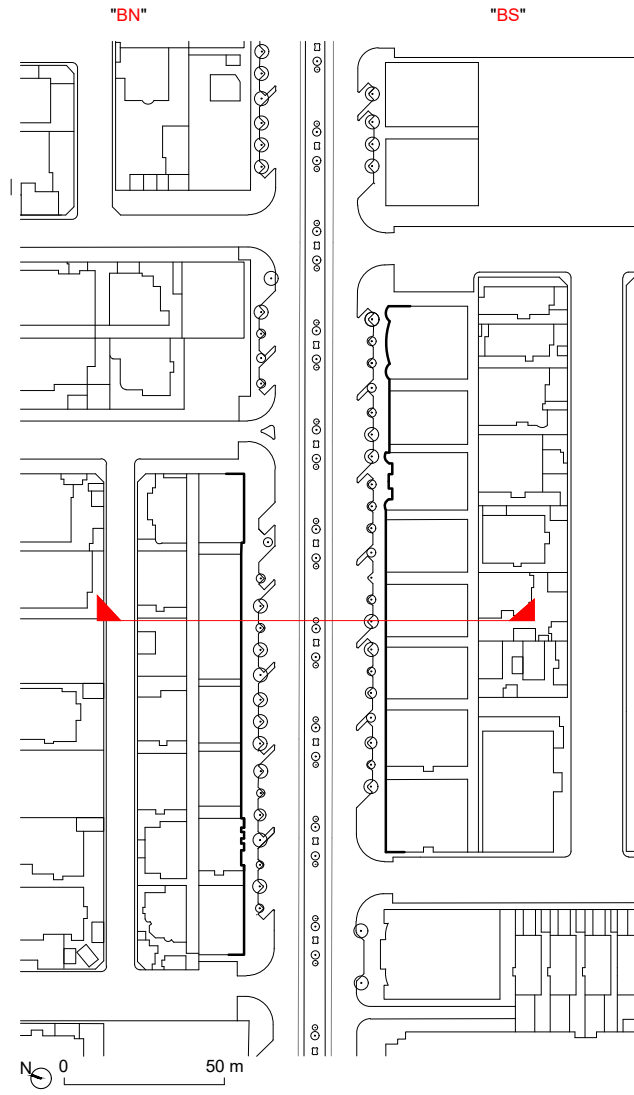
Abi Jafar Al Mansour Street: Plan and cross-section of sample "B." (Source: Author's Edition).
